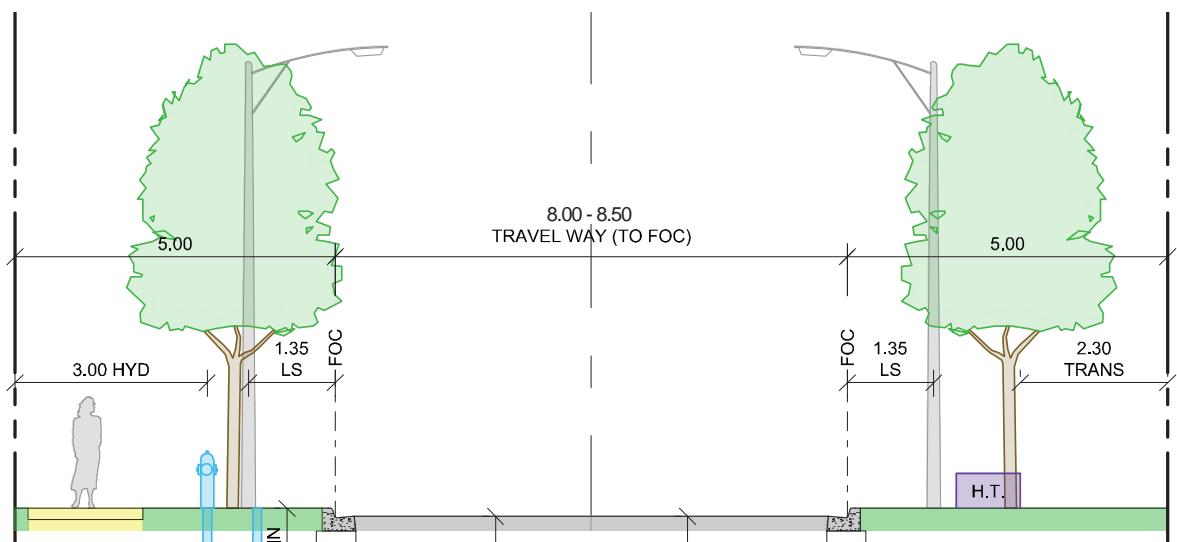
18.0m local road with sidewalk on one side (8.0m - 8.5m pavement width)
